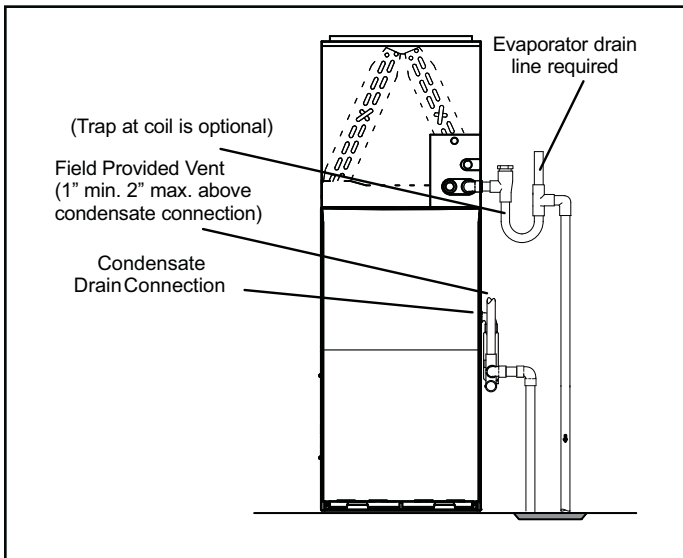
Furnace with Evaporator Coil Using a Separate Drain
